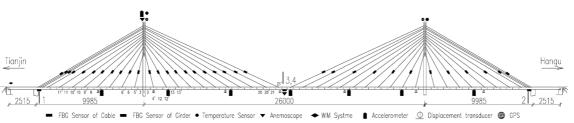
The elevation diagram of Yonghe Bridge and positioning of rover GPS
